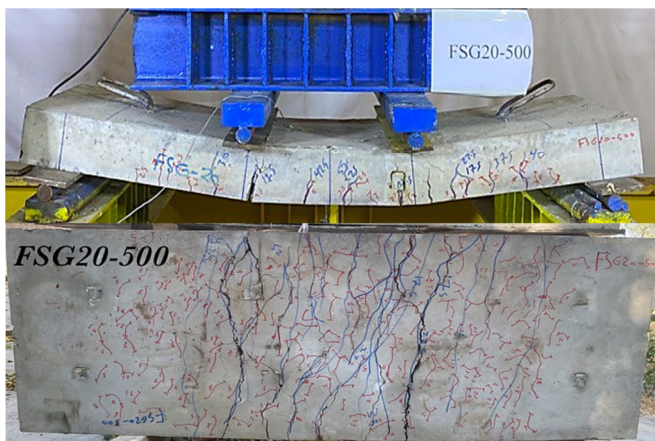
Crack pattern of the specimen FSG20-500. Top: side face, bottom: bottom face.
